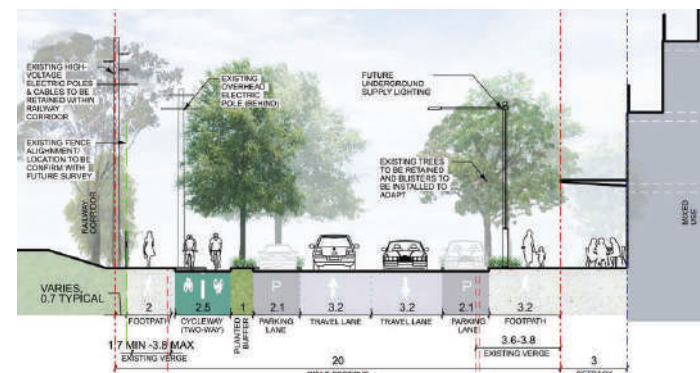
Blaxland Road South (Between Llewellyn Street and Train Station) - Section
